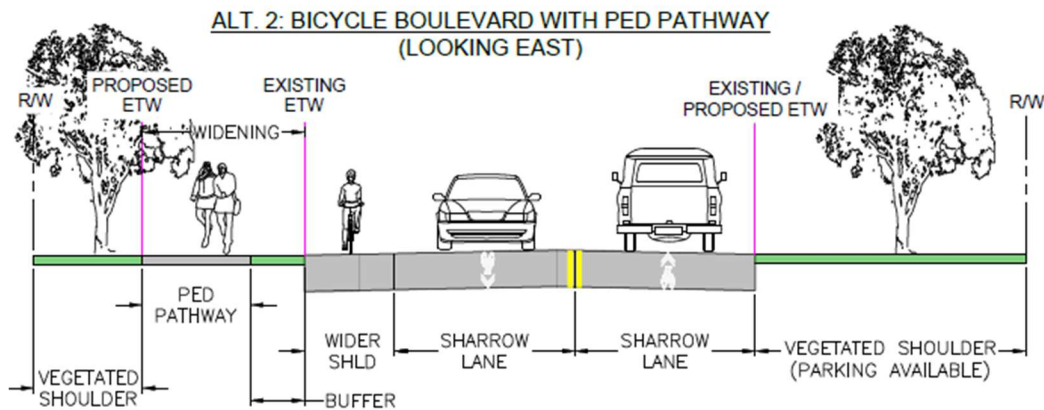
Coleman Avenue (Menlo Oaks) Alternative 2
